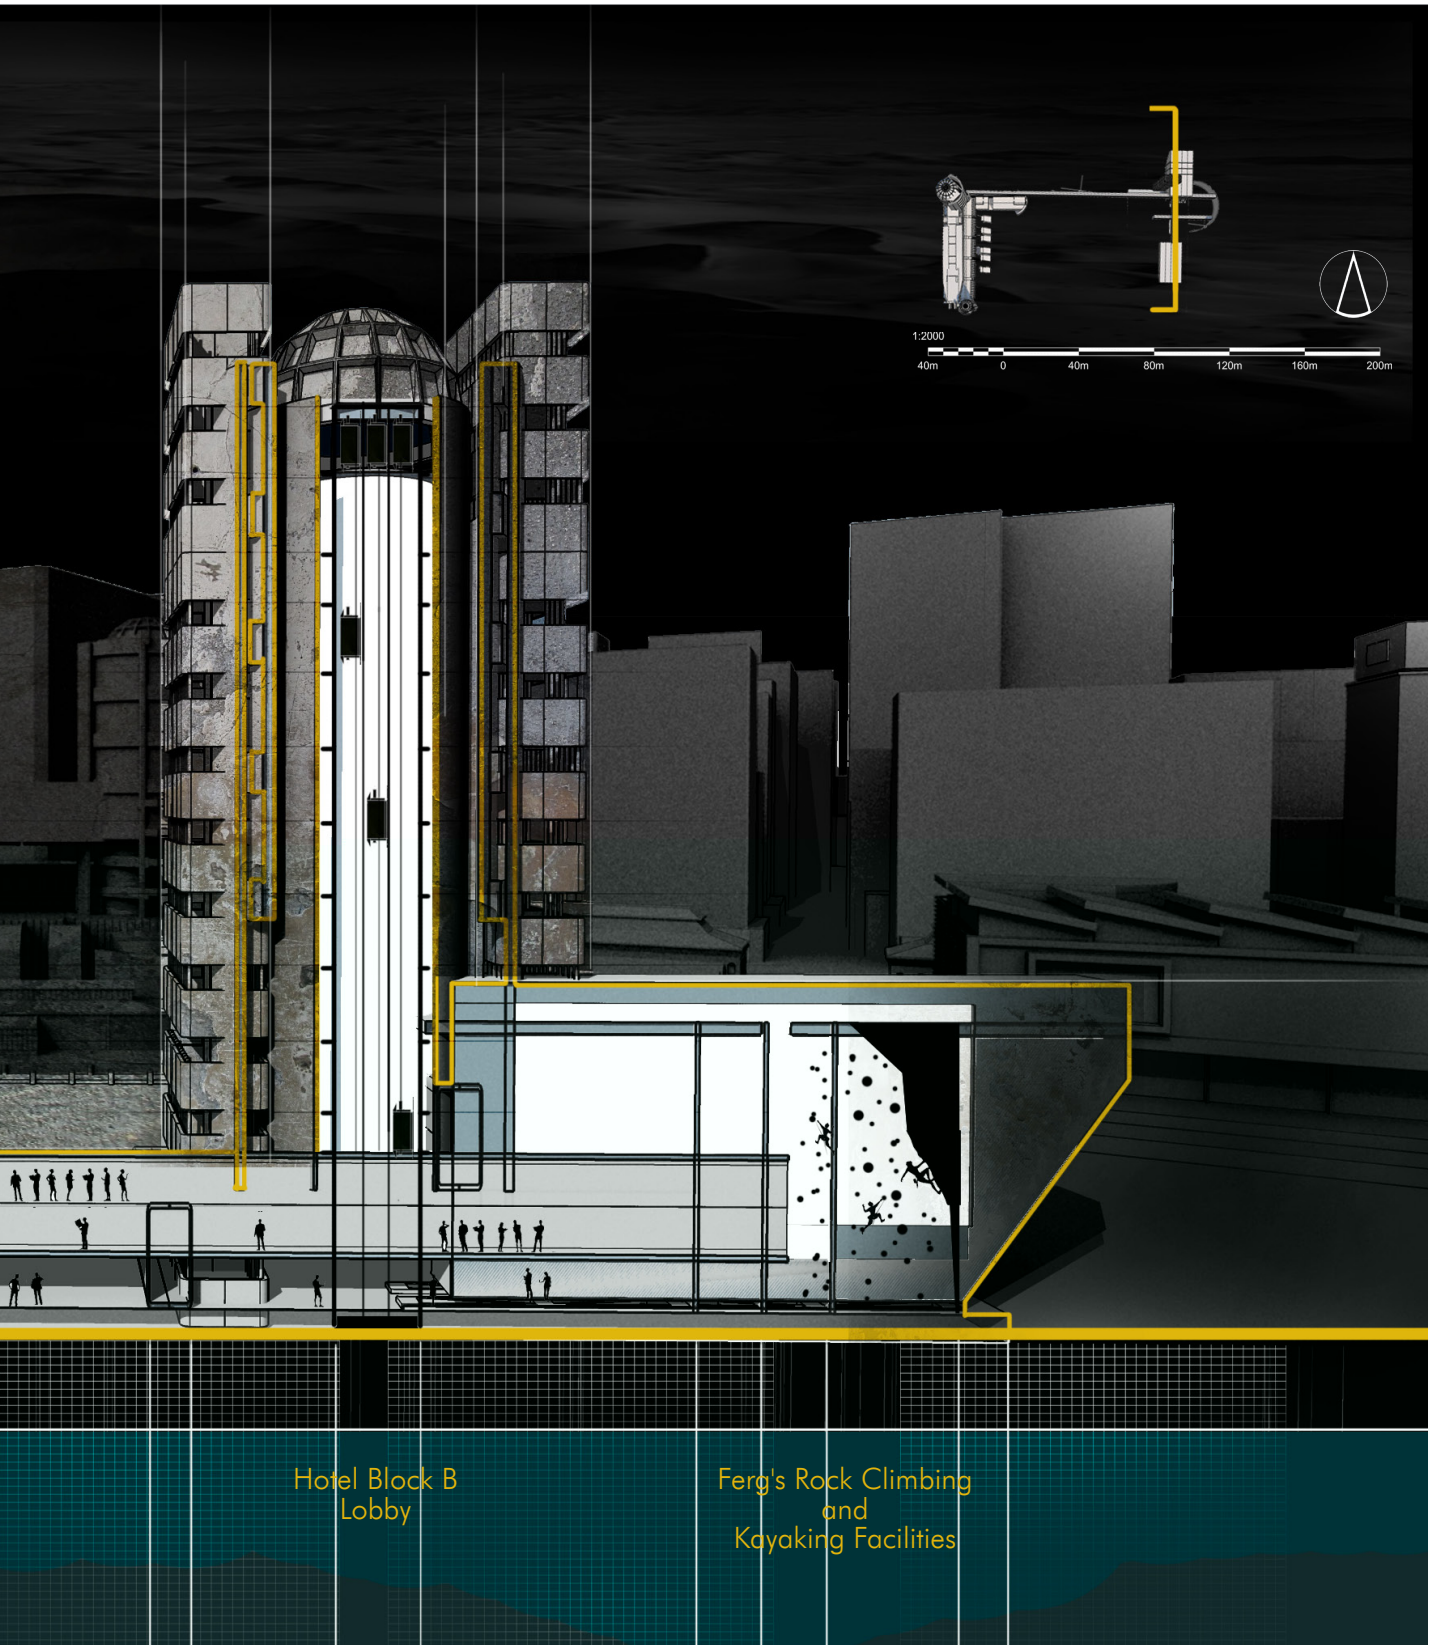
Sectional view looking west of new hotel Block B lift core at the centre, indoor soccer to the south and indoor rock climbing to the north.
